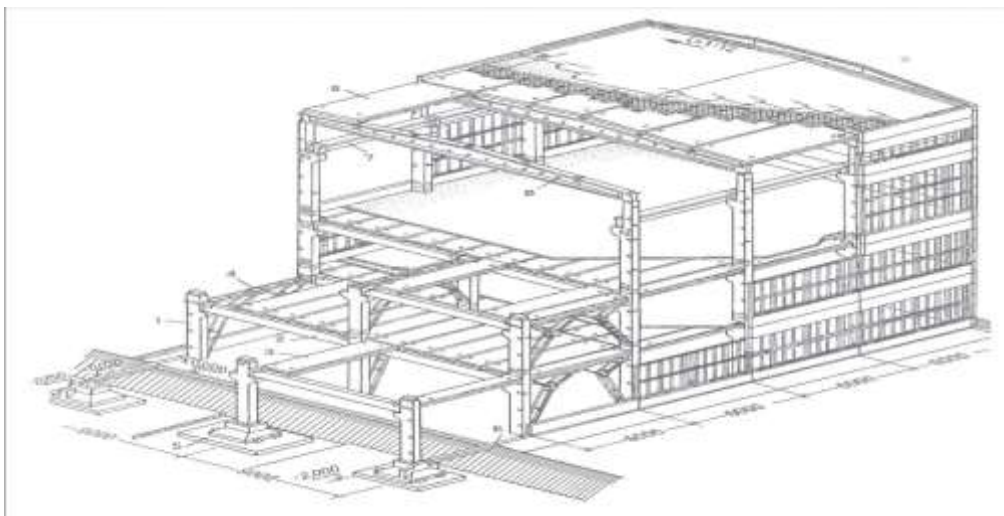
Complete prefabricated reinforced concrete frame of a multi-story industrial building with beam-type floor slabs.
